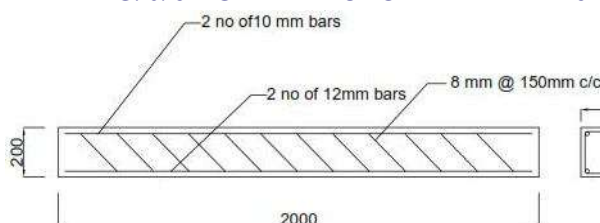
DOUBLY REINFORCEMENT DETAILS
